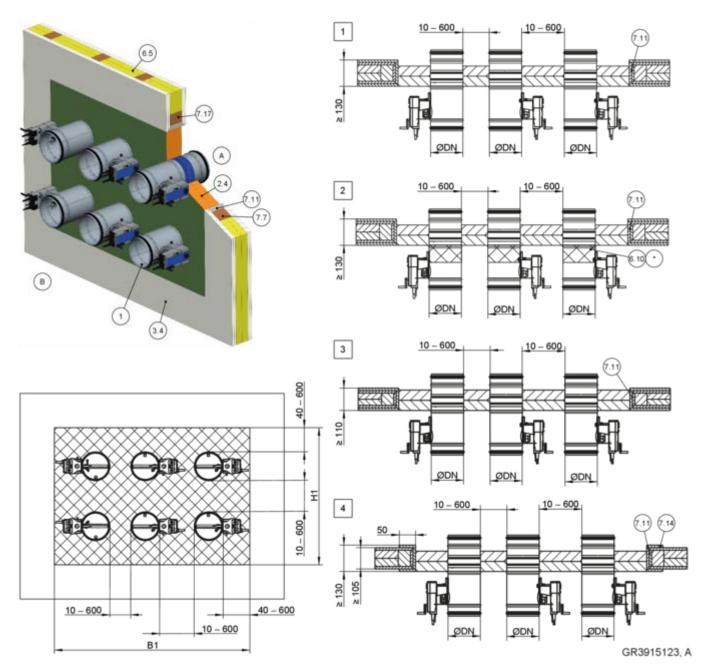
Dry mortarless installation with fire batt in lightweight partition wall with timber studs – Multiple occupancy of an installation opening
